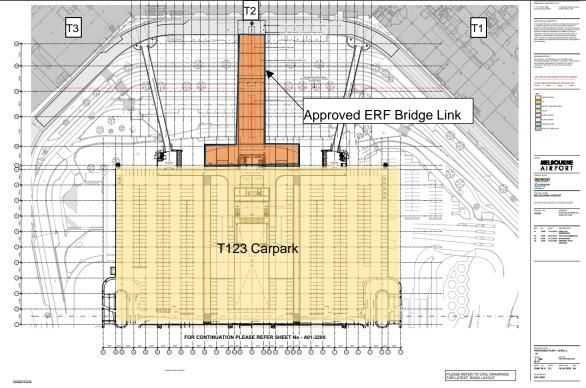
Naarm Way Stage 2 Project MDP design – ERF Bridge Link from T123 carpark to T1 Departures. Source: Melbourne Airport Elevated Road & Forecourt Stage 2 Project MDP (October 2021)
